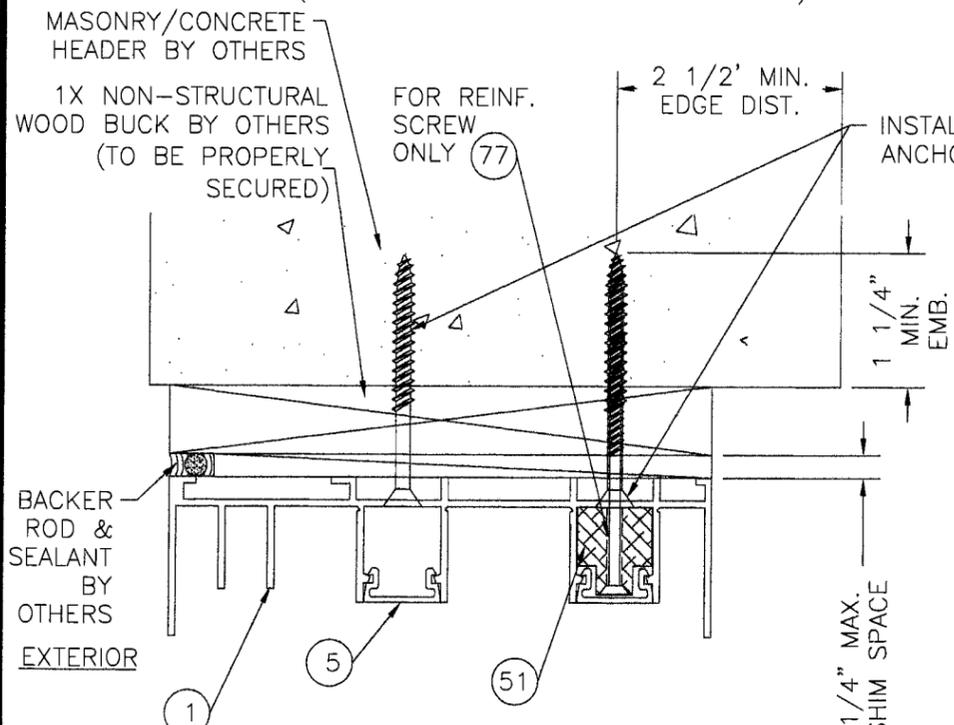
T WS/NS HEAD SECTION W/ ITEM #51 TO MASONRY/CONCRETE VERTICAL CONDITION 1 (1X BUCK TO BE PROPERLY SECURED)
